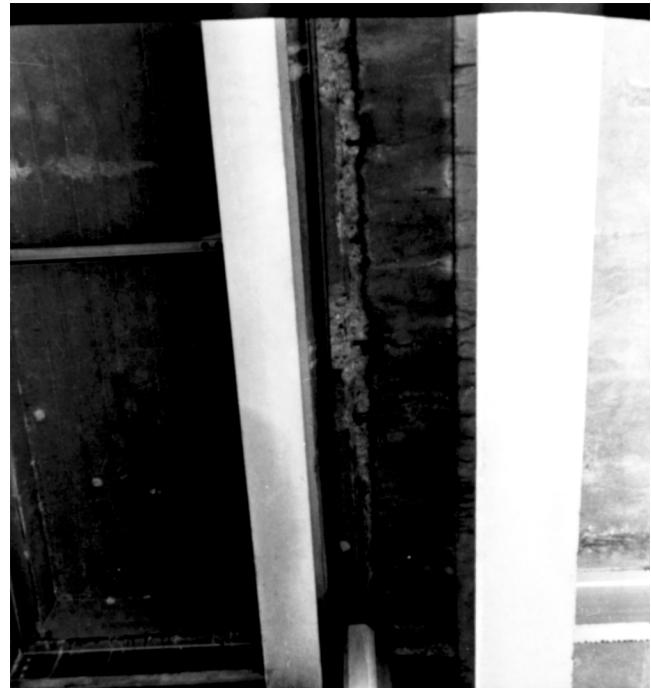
Deck soffit spalls under reinforcing steel dowels.
